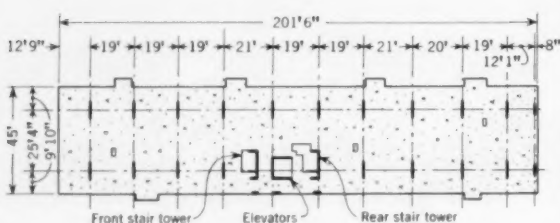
Typical floor plan has area of 45 ft by 201 ft 6 in. Floors in the modern apartment building are 9-in. flat slabs with 6-ft 4-in. continuous cantilevers, from face of column, along each side.
